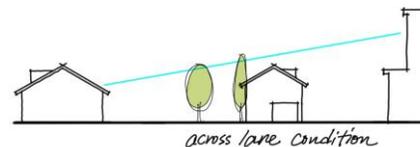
If a proposed building would be taller than adjacent development, upper floors should step back to provide transition in scale.
